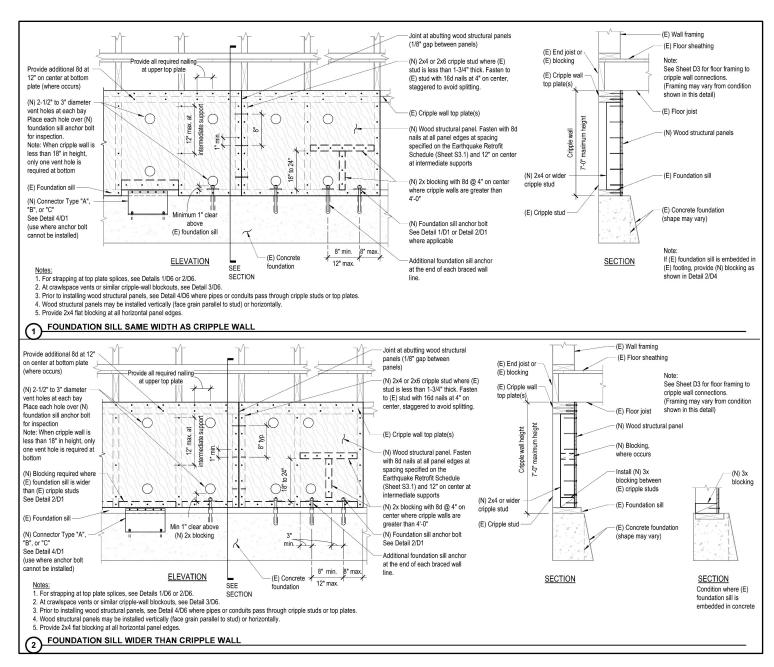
Wood structural panel installation without tie-downs. Sheet D4.
